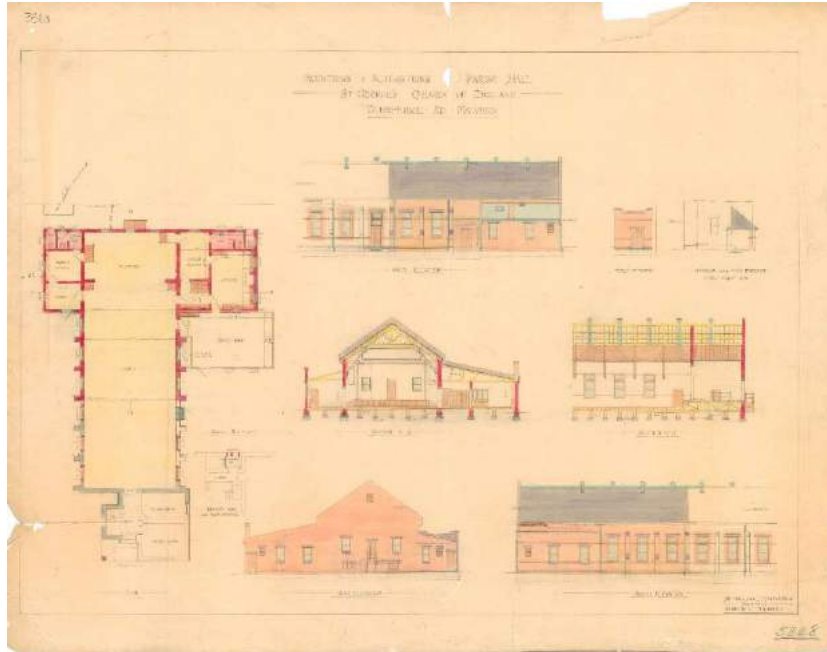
Plan of Additions and Alterations to Parish Hall A & H Peck, 1925 (Source: SHC MB3310)
